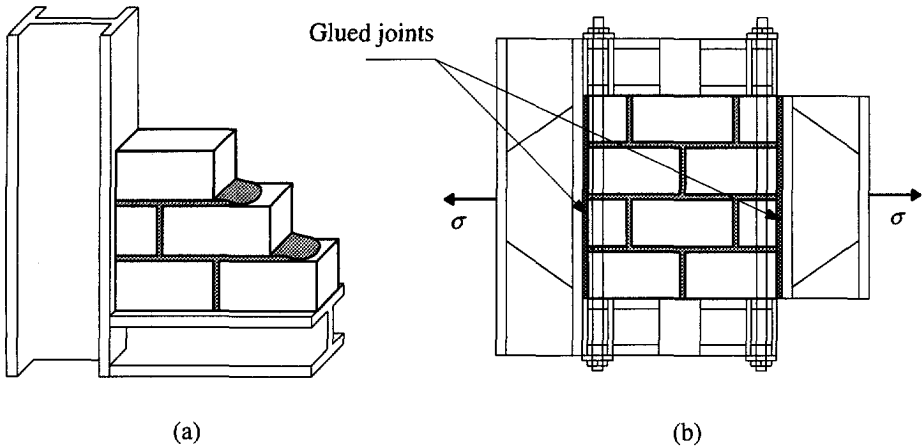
Test set-up for tensile strength of masonry parallel to the bed joints, Backes (1985): (a) building of the test specimen; (b) test specimen before 90° rotation and testing.
